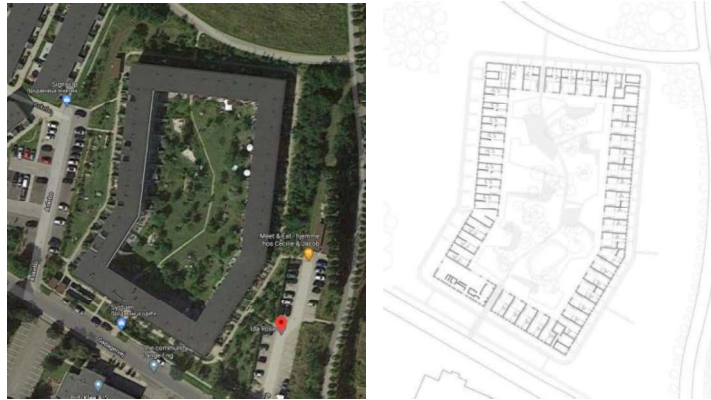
Lange Eng - (a) Complex, and (b) Floor plan
